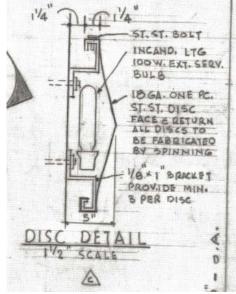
7: Disc detail, original drawing by architect Lee Casaccio, Alterations Colonial Federal Savings and Loan, Sheet 3 - Front Elevation and Details, 1962, courtesy of Lee Casaccio, Jr.
